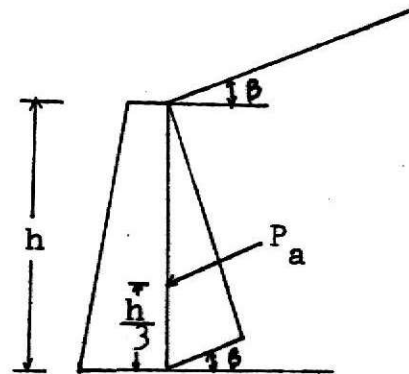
Retaining wall with vertical back and sloping surcharge
